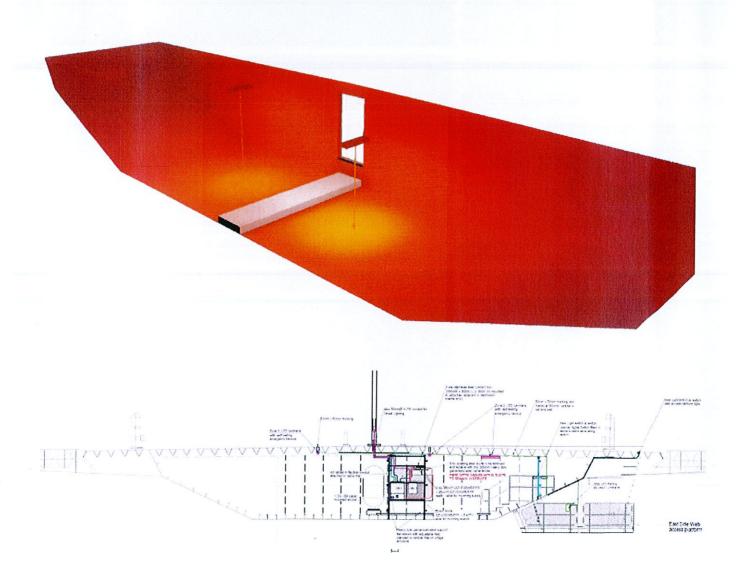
Typical cross section through bridge at web access platform location with (above) luminance modelling
